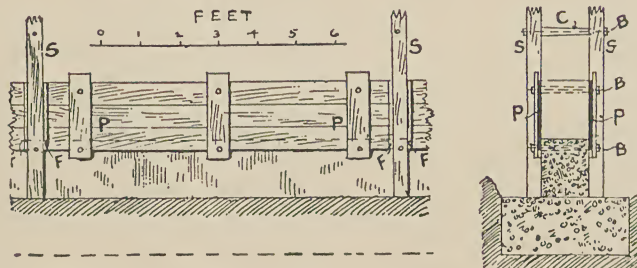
Elevation and Section of Building-frame for Concrete Walls.
